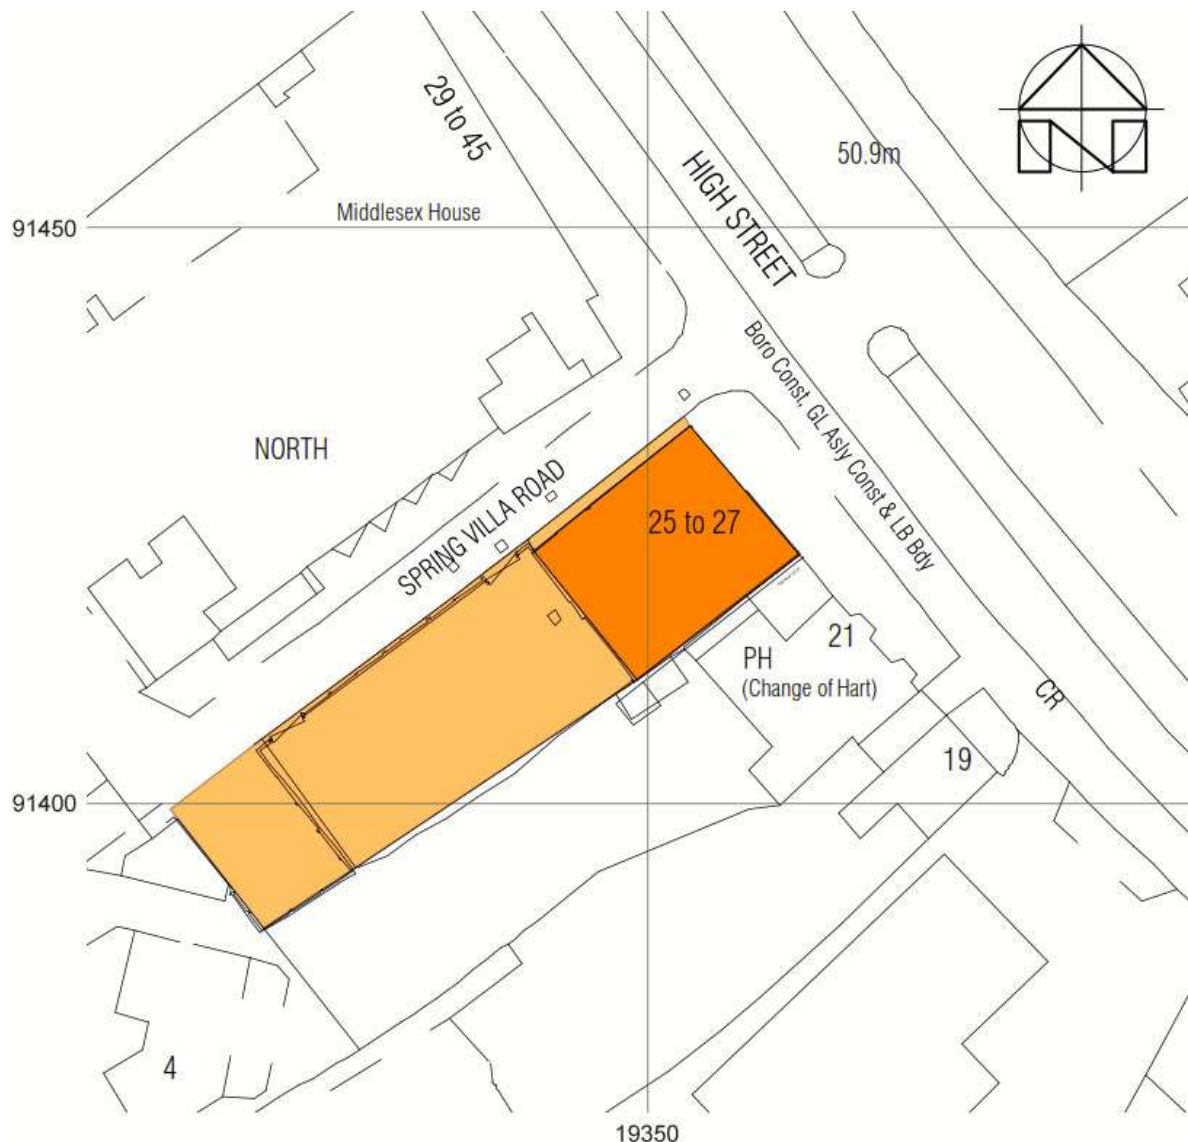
Site outline plan, showing the pre-development building footprint (in darker orange)
